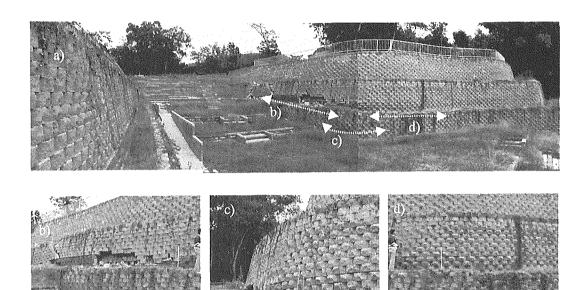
Different performances of reinforced-soil retaining walls (at Chang-Chiun Park in Chung-Hsin New Village; site 7 in Fig. 1)
